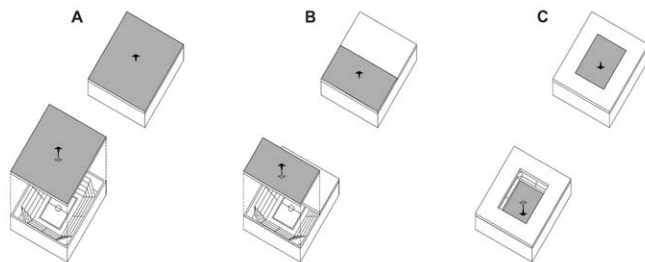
A. Lifting system opening entire roof structure; B. Lifting system opening individual roof parts (roof structure lifting); C. Lifting system opening individual roof parts (roof structure lowering).
